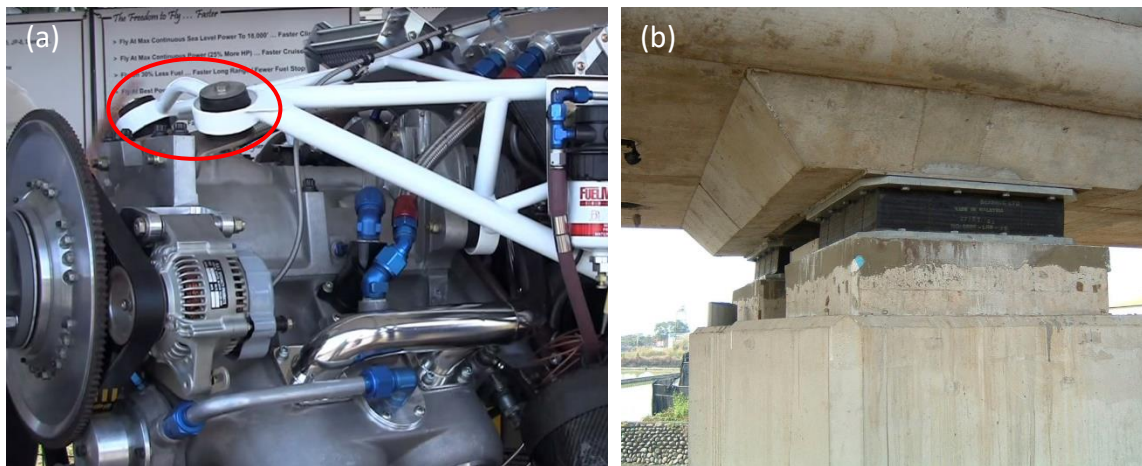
Rubber support in (a) engine mount system, (b) a bridge bearing
